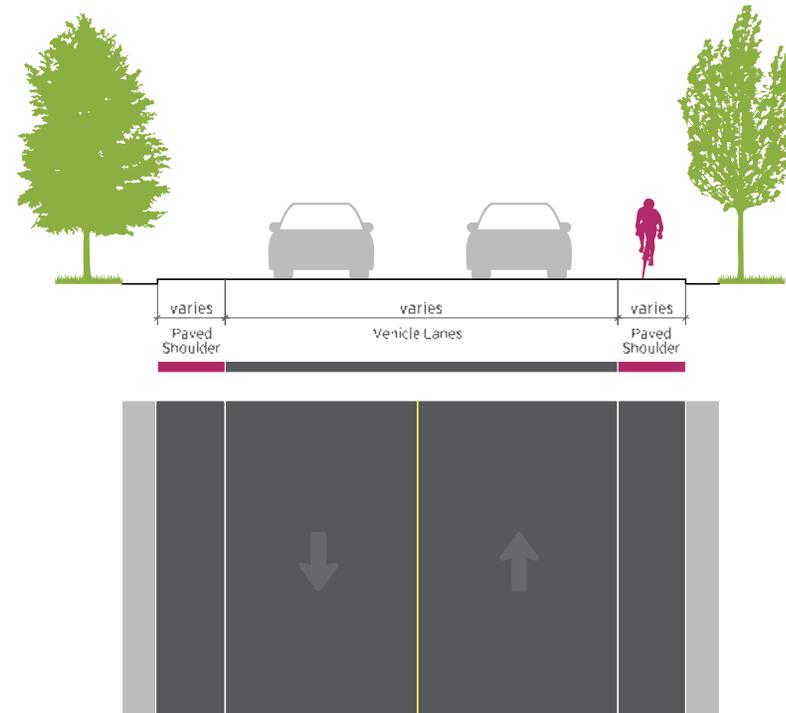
| EXAMPLE OF BICYCLE-ACCESSIBLE PAVED SHOULDERS
